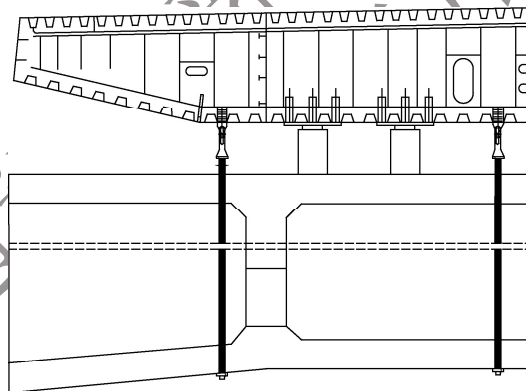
Detailing of the temporary structure for fixing the girder and tower in the vertical direction in the sutong yangtze river highway bridge
